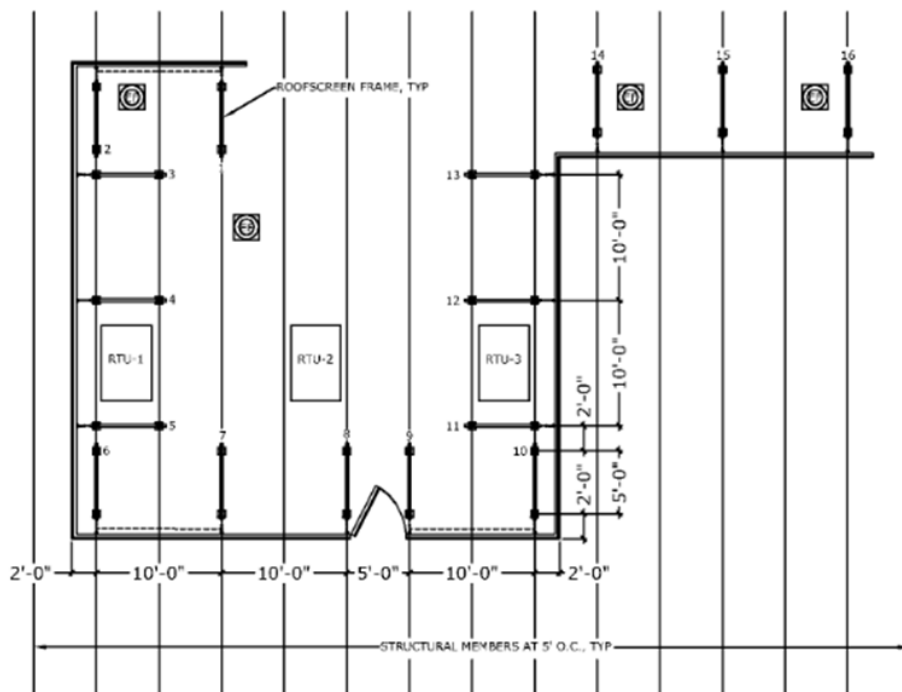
Example Layout - Screen Wall Support Frames Aligned with Roof Framing (RoofScreen)
